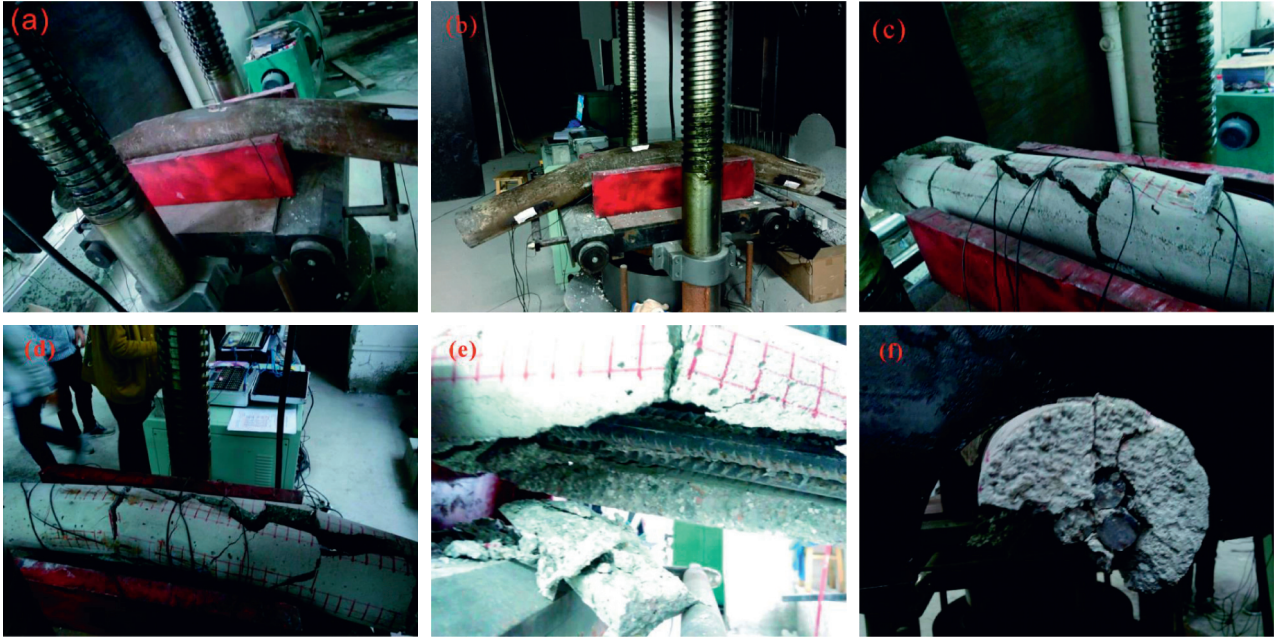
Deformation and failure of micropile specimens under loading. (a, b) Deformation of the specimens (GGH). (c-f) Destruction of the specimens (LGH).
